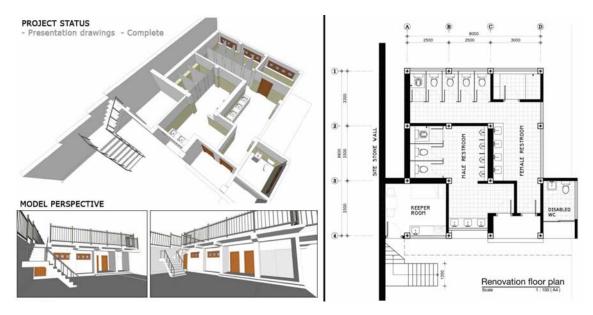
Renovation design of the existing restrooms at Memorial Chorten.
